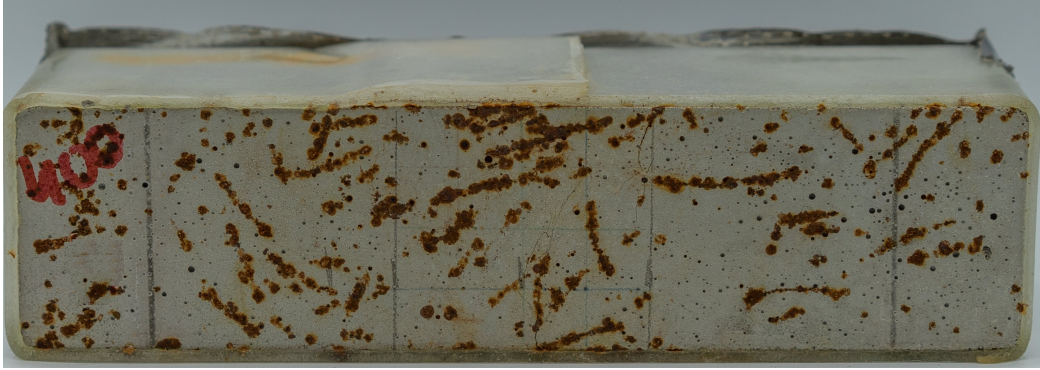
Tensile surface of specimen 3.0%-400-5 after cracking.
